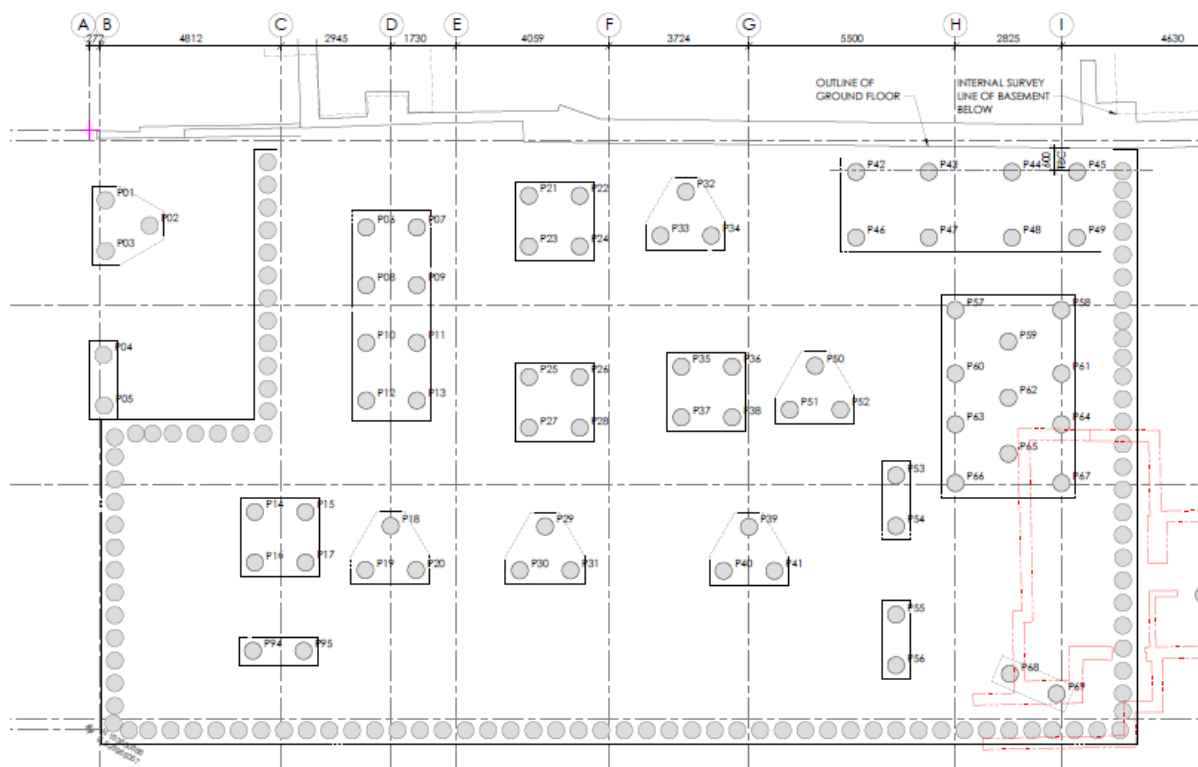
Contiguous piled wall layout – extract from drawing CCL-28791-S-CAM-GA-FN-0097-C1
